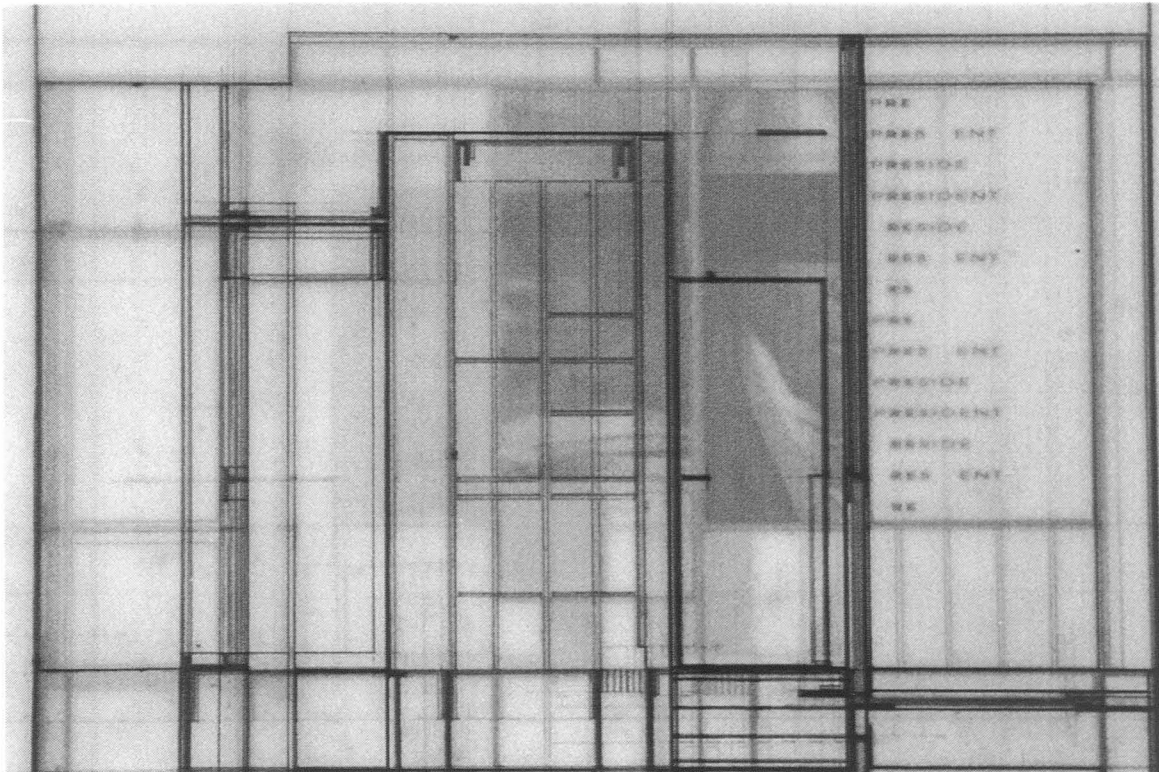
Parking Garage Elevation- Upper Level with Section Drawings Screened Behind
